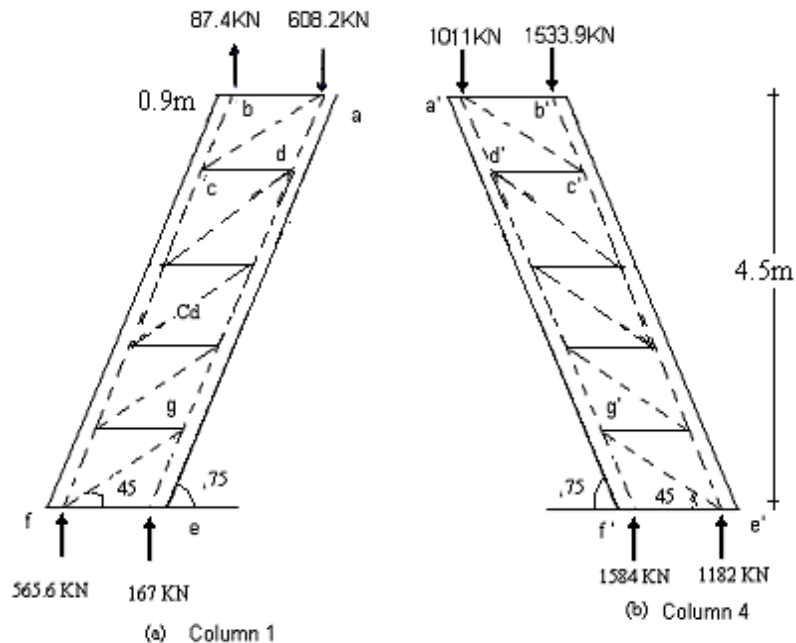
Inclined columns with STM model, diagonal strut at 45° and horizontal tension
